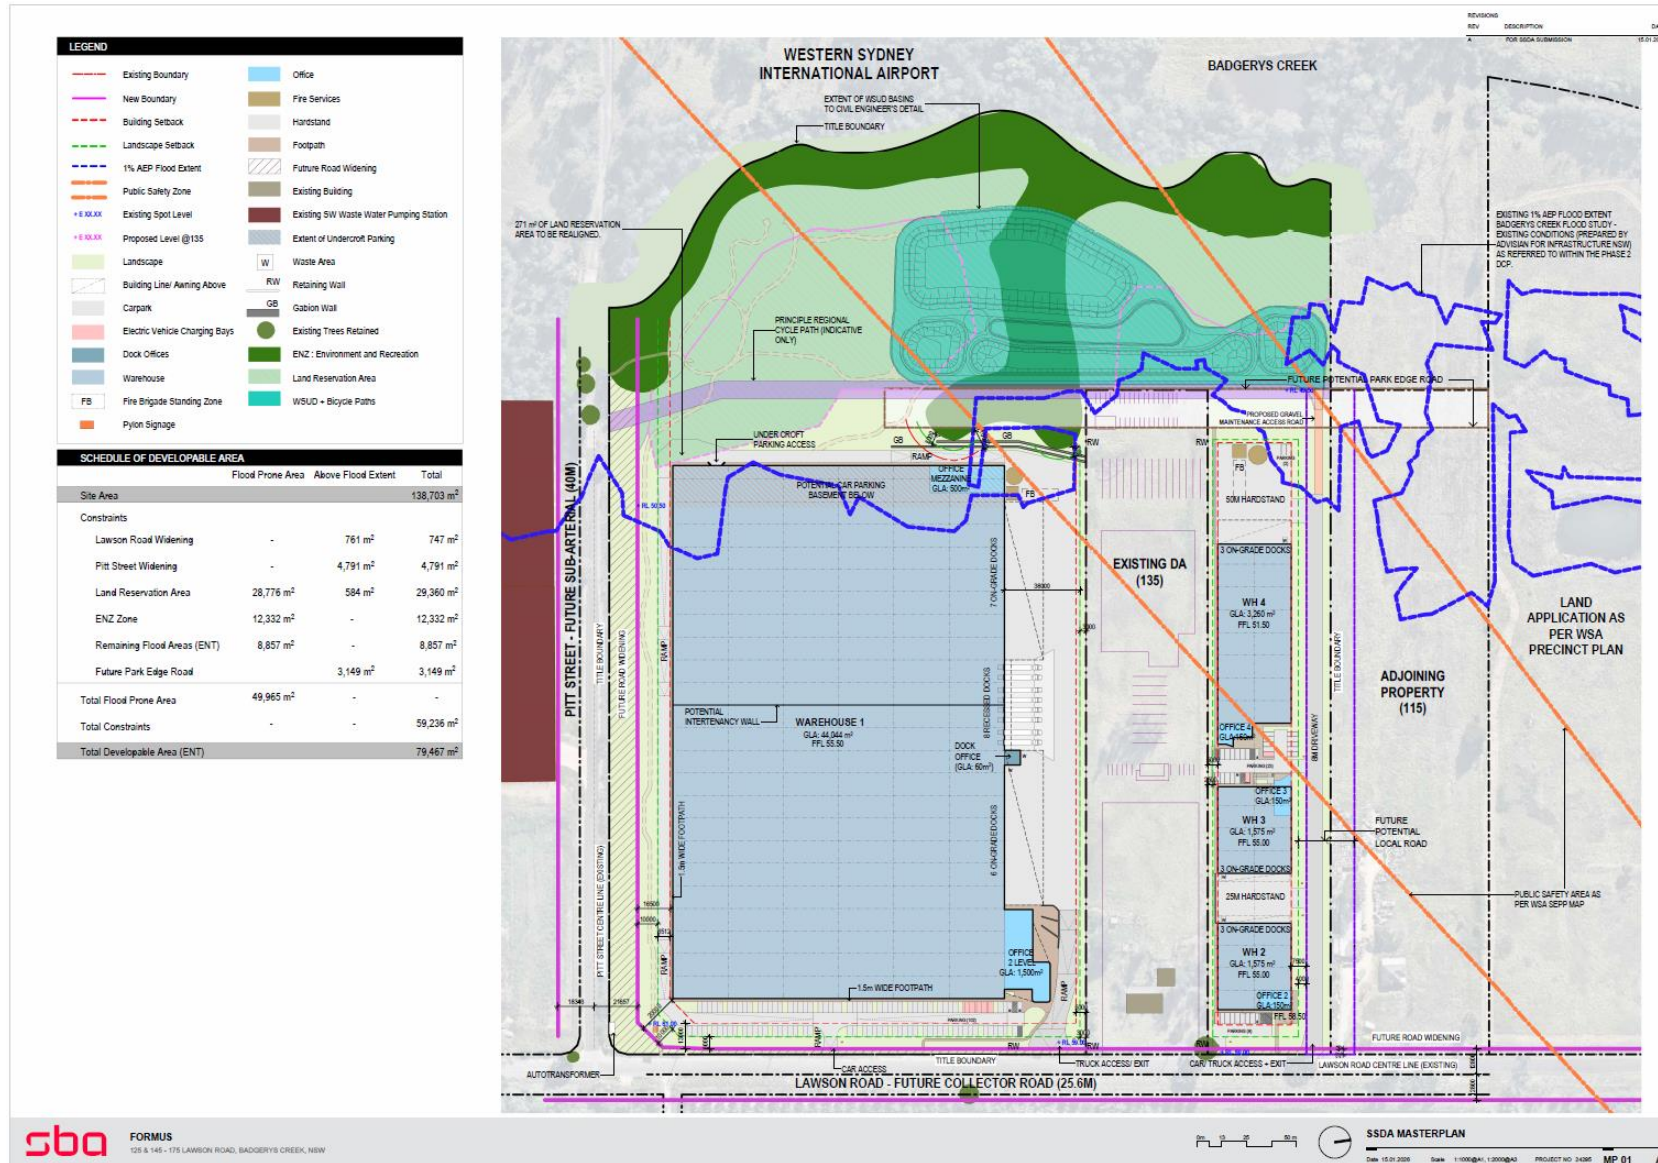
Extract of proposed architectural drawings showing the SSDA Masterplan.
